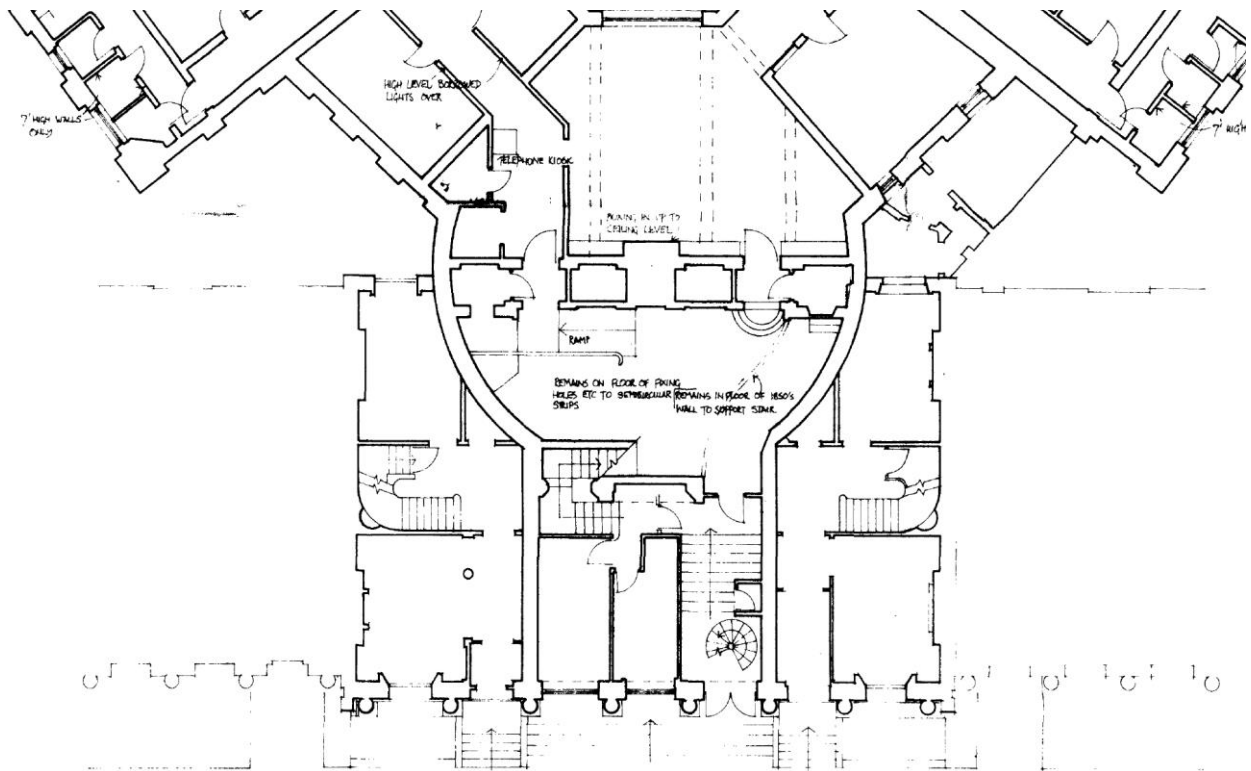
Existing ground floor of nos. 17-19, 1994. Camden planning ref: HB/9370268.
